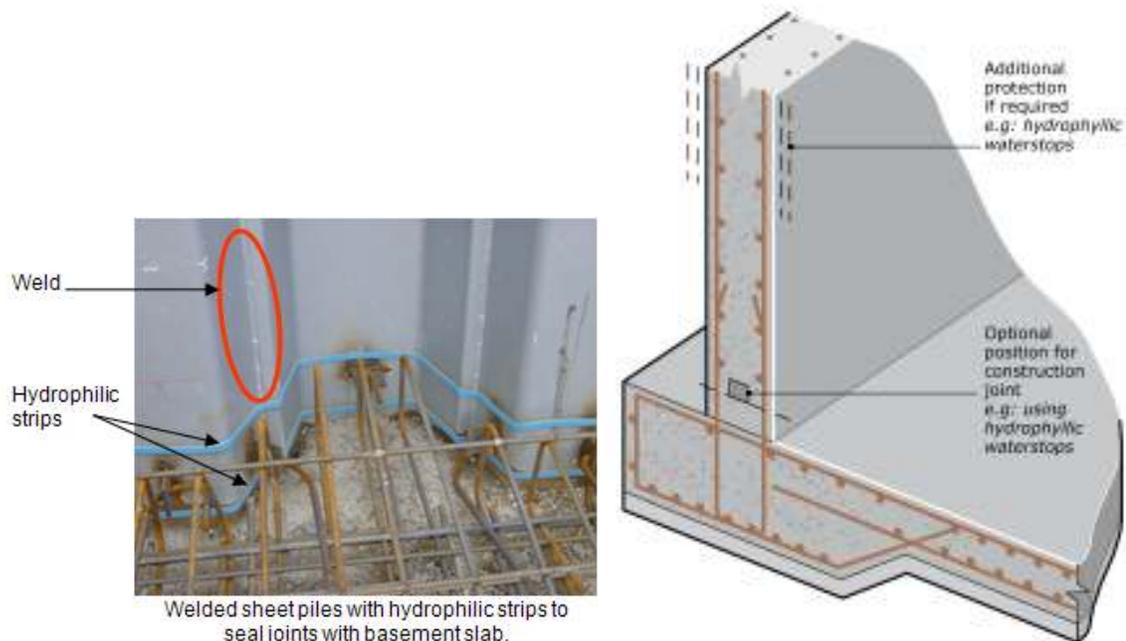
Example of structurally integral protection (Type B) and sketch showing typical detail
